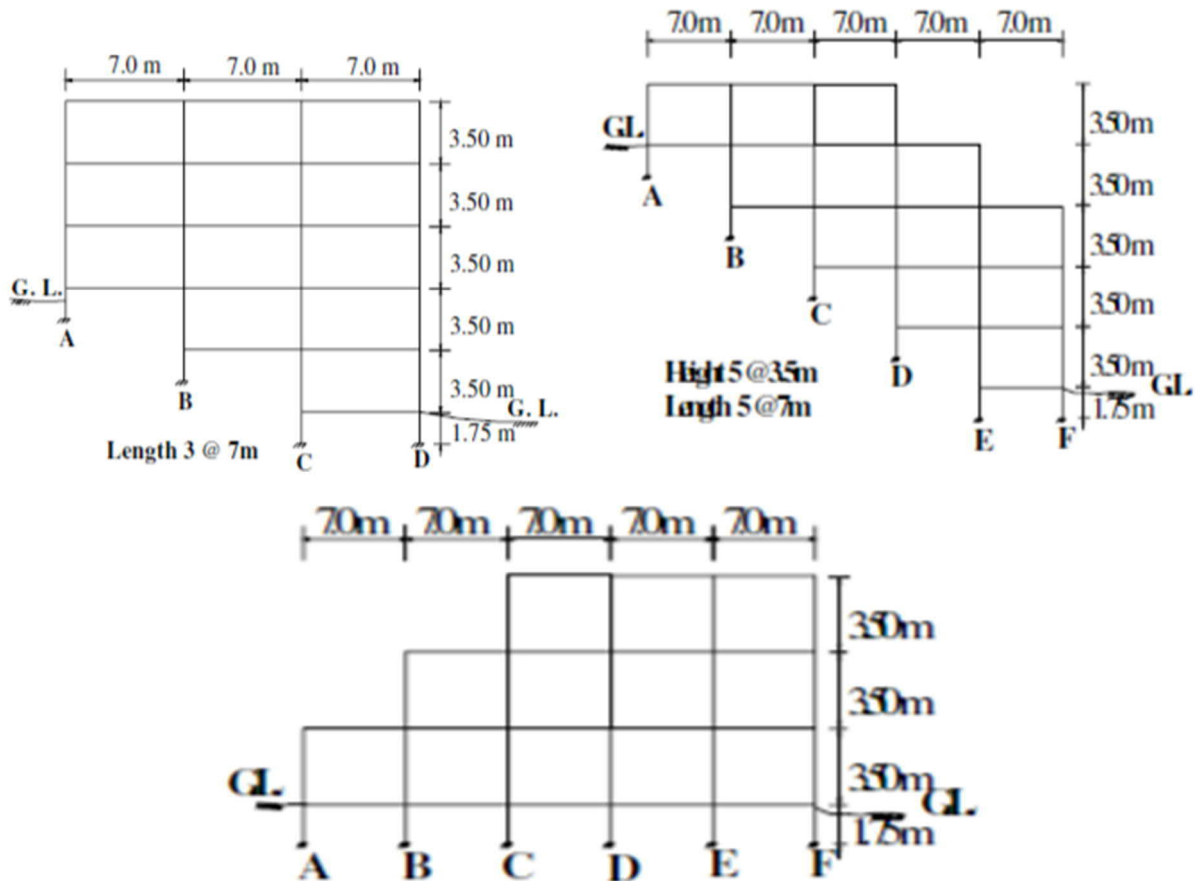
Step Back Building, Step Back Set Back Building on Sloping Ground and Set Back Building a Flat Ground
